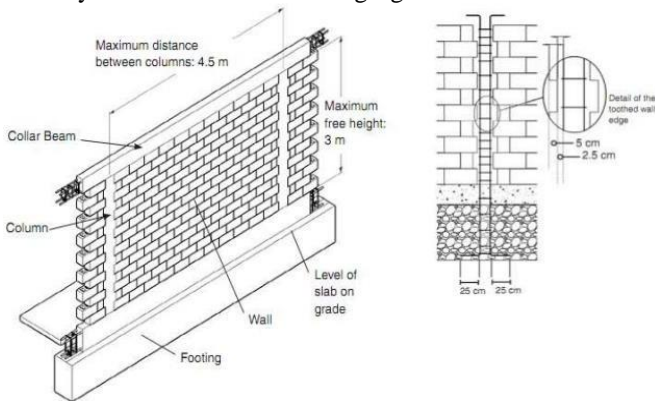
Left figure shows maximum distance the confined elements with the masonry wall and right figure shows toothed edges of the wall with tie columns.
